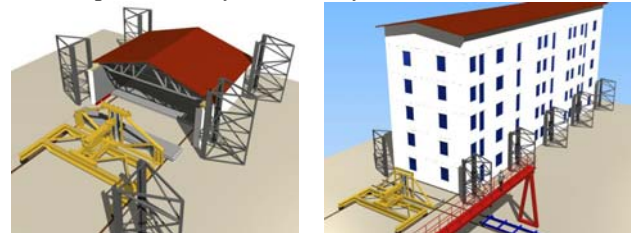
Simulation and Pilot Test of new automated construction method: An automated system assembles the floors in the ground floor level. Hydraulic presses raise floors and buildings step by step. Skanska, Sweden, 2009.
